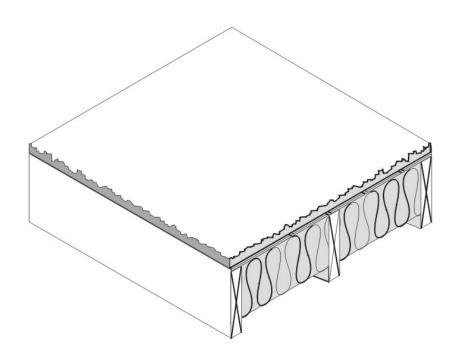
Wood Framed Floor without a Crawl Space
